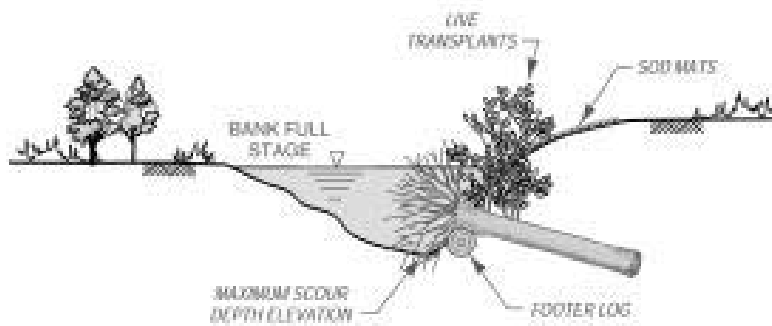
Rootwad Elevation View (from Sylte and Fischenich, 2000).
